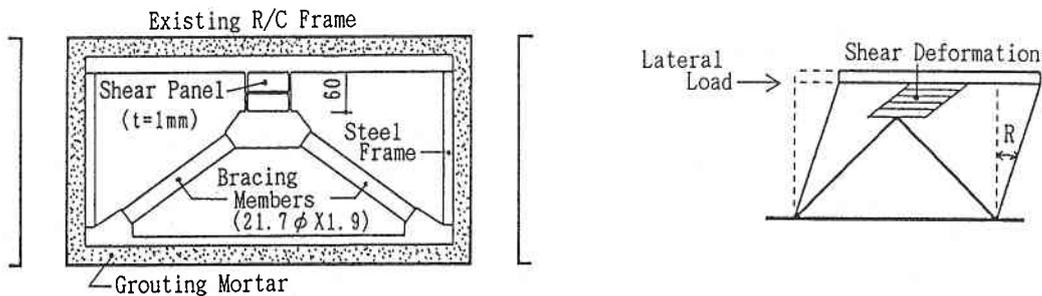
Retrofitting with Ductile Steel Framed Brace
